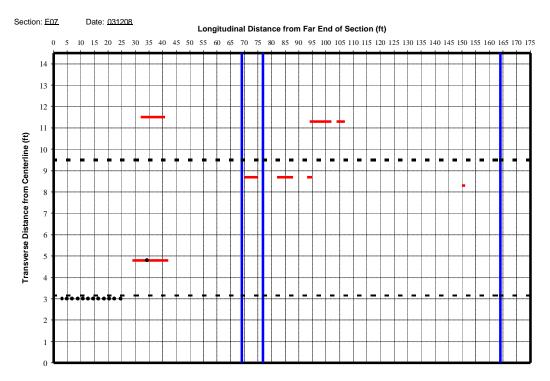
Distress Mapping on an Extended Traffic Section with Cracking
